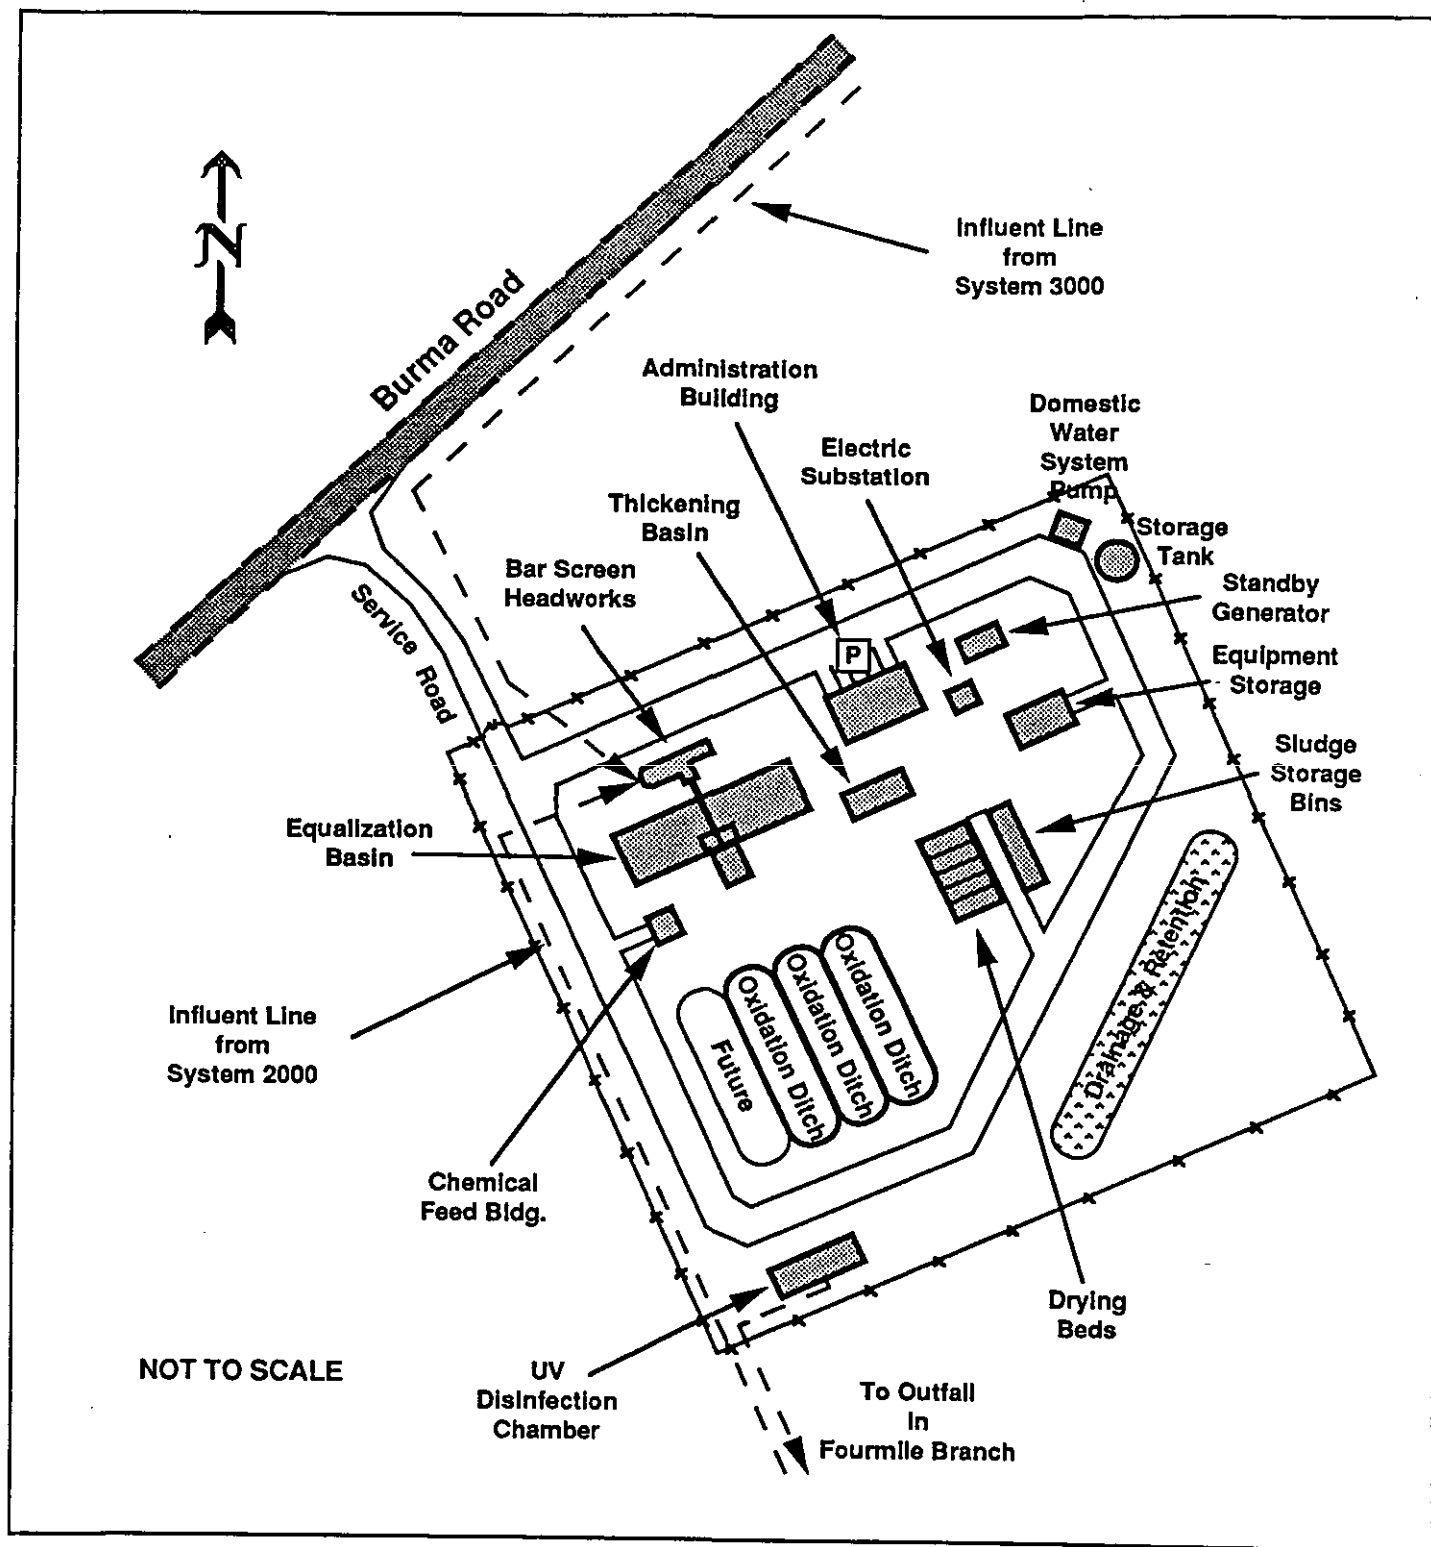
Site map illustrating the layout of the proposed Central Treatment Facility for sanitary wastewater at the Savannah River Site, South Carolina.
